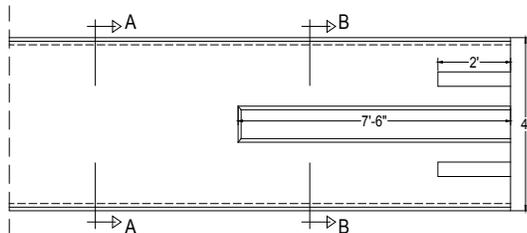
Top Plan View of the End of the Sallow Flat Soffit Precast Floor Beam (ft = 0.3048 m)
